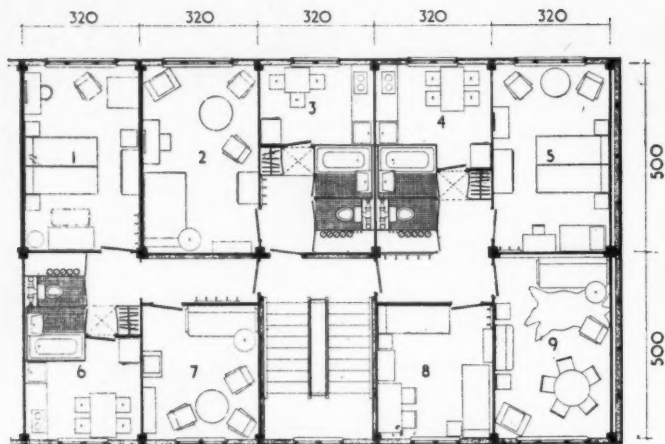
(left). Diagram showing constructional system of Block No. 11—large precast concrete slabs with foamed slag aggregate. The point-blocks are built in the same system.
